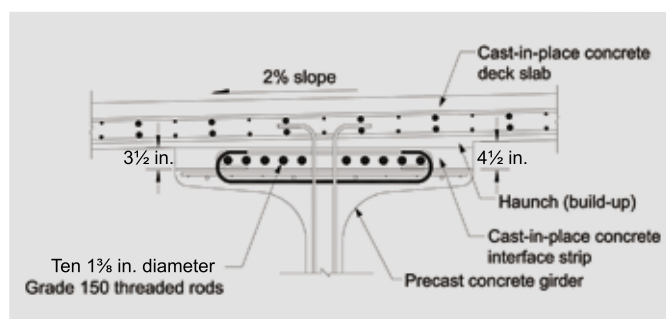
and 7 show typical girder/deck cross sections at the midspan and the pier end, respectively. Figure 6 illustrates the recommended minimum haunch thickness of 3 in. (75 mm) at the midspan at the centerline of the girder. Assuming a 2% cross slope, the thickness varies by about 1 in. (25 mm) across a 4 ft 1/4 in. (1.225 m) flange width. Assuming that the girder will camber at least 1 in. at the time of deck placement, the haunch thickness would be 4 in. (100 mm) at the girder centerline near the pier end. This corresponds to a 3 1/2 in. (89 mm) thickness at the
